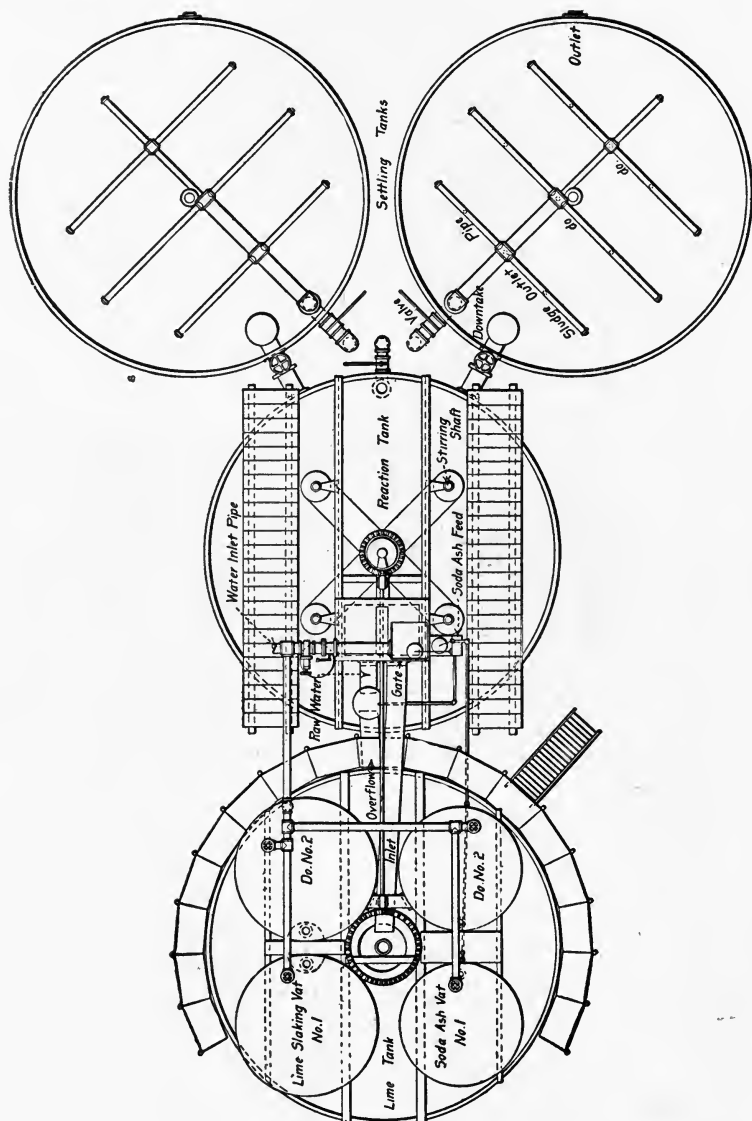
Plan of Water-softening Plant, Proctor and Gamble Co., Ivorydale, O.
